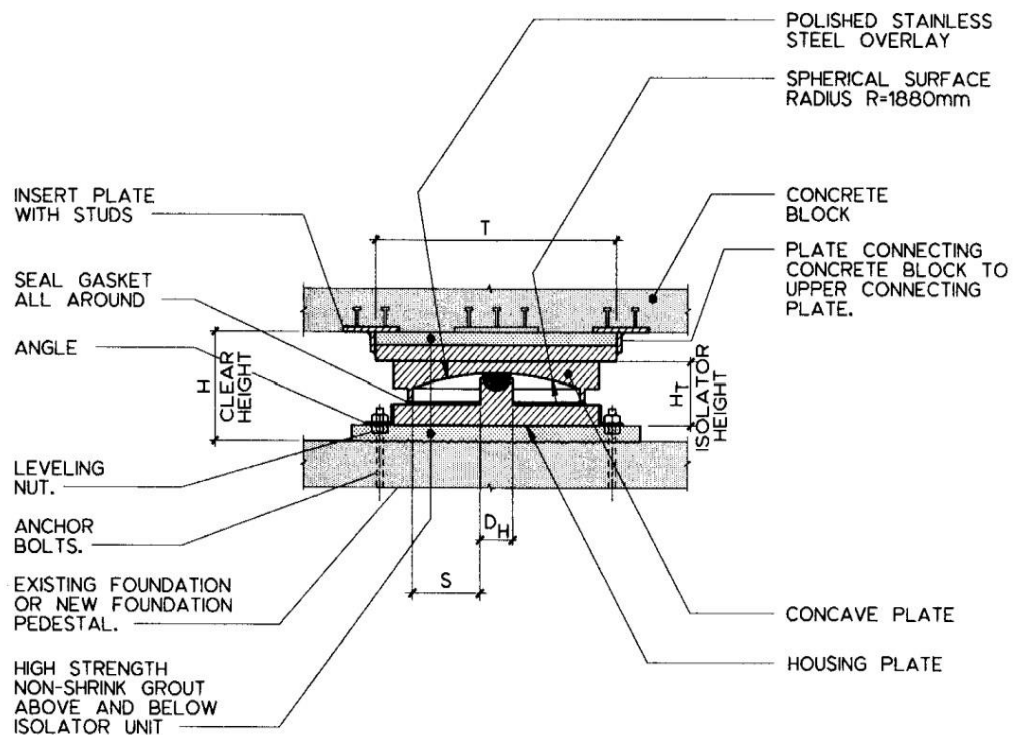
Cross sectional view of FPS bearings (Georgios and Antonios, 2015)
